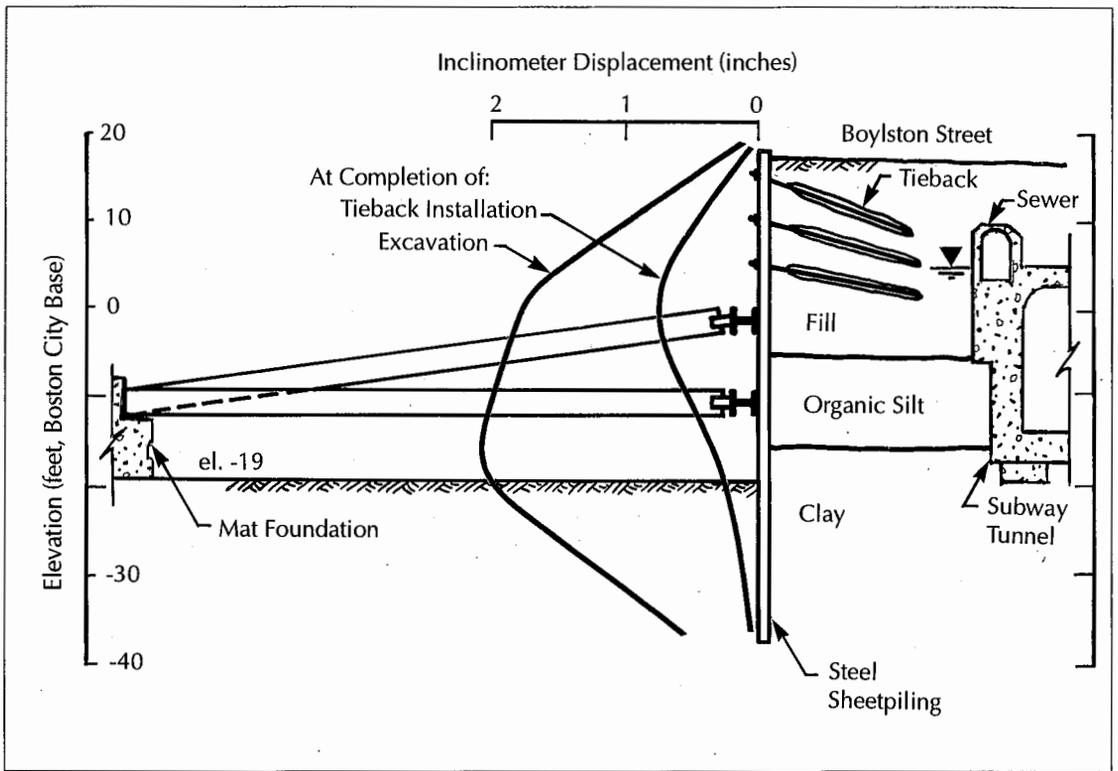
A cross-section of the excavation support system for the 222 Berkeley Street project.
